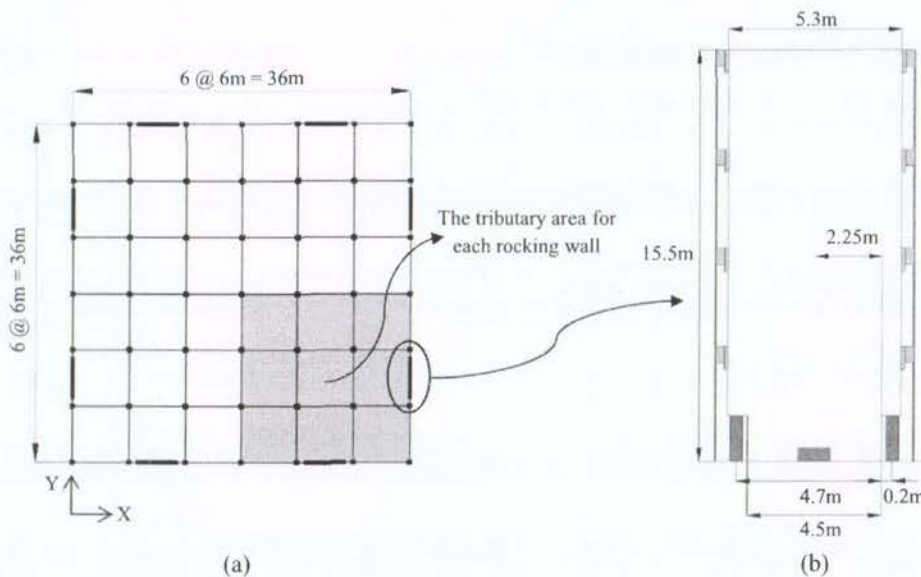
The prototype building: (a) Plan view (b) Specifications of the rocking walls.
